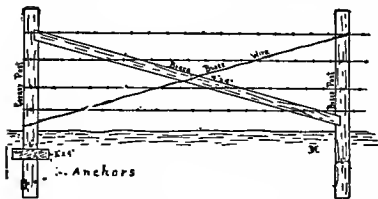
A corner post braced one way and anchored so the strain of the wires will not pull it out of the ground.
